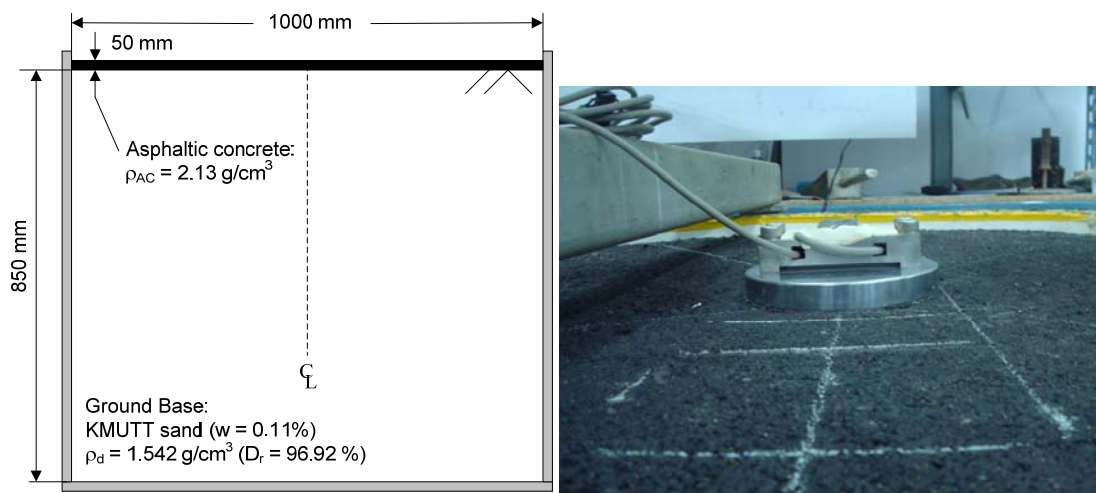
Illustration of ground base with asphaltic concrete layer (paved surface).
